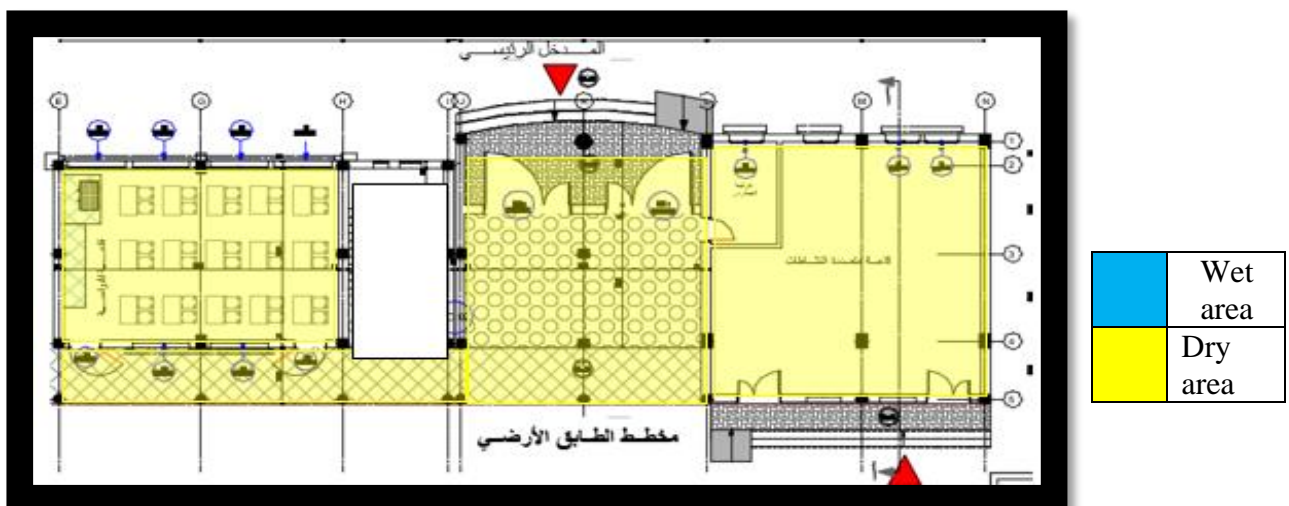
feild features in the ground floor ,Source: ground floor plan adapted by the author 2025
